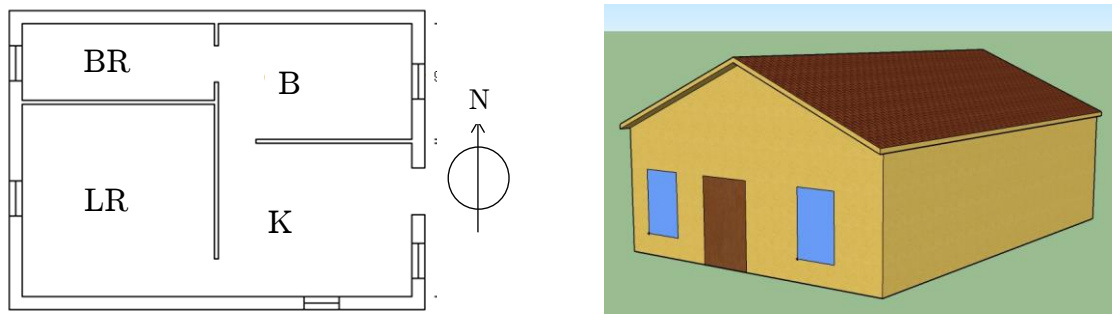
Plan of the building (left) and 3D model developed by means of Google SketchUp (right).
